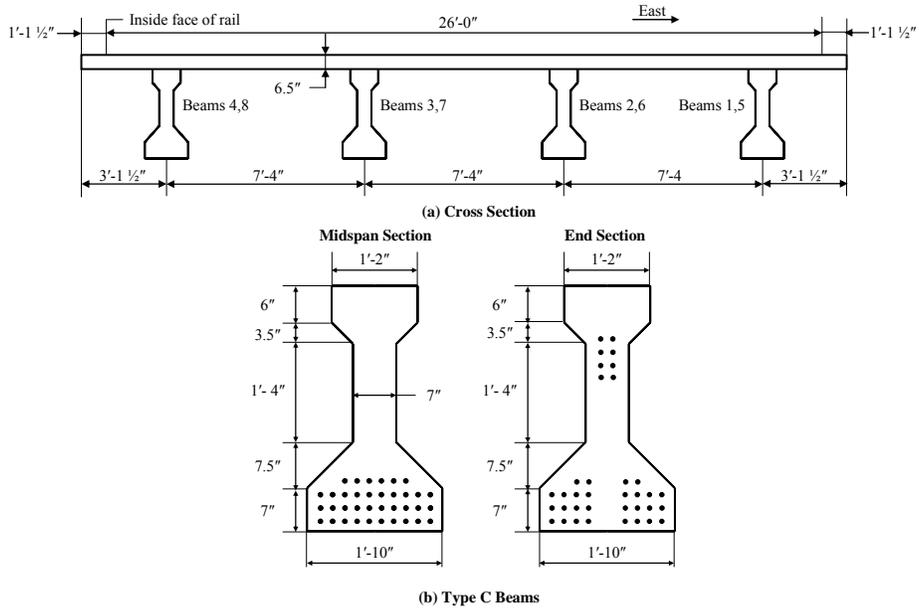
Cross Section and Beam Details for Lampasas River Bridge
